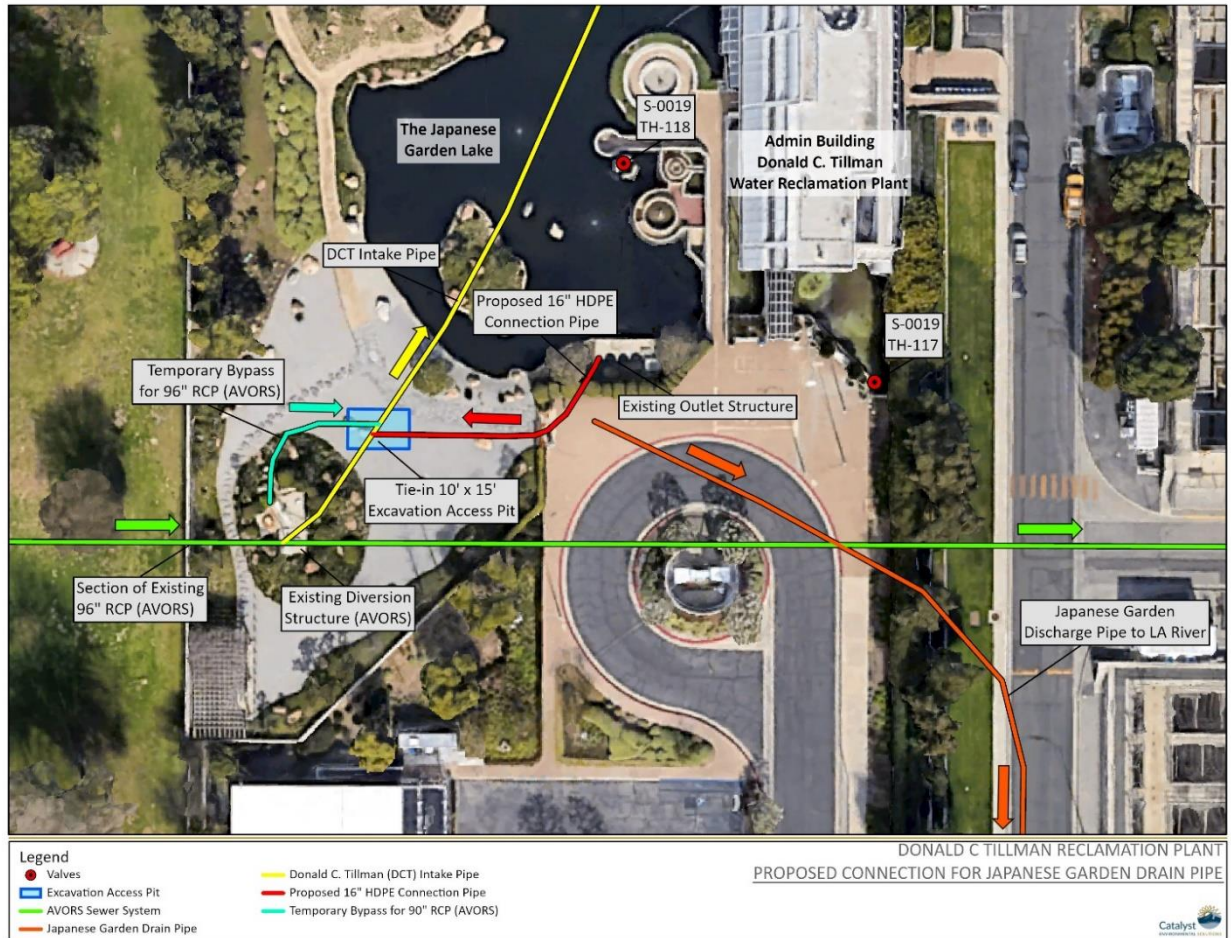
Proposed Connection for Japanese Garden Drain Pipe
